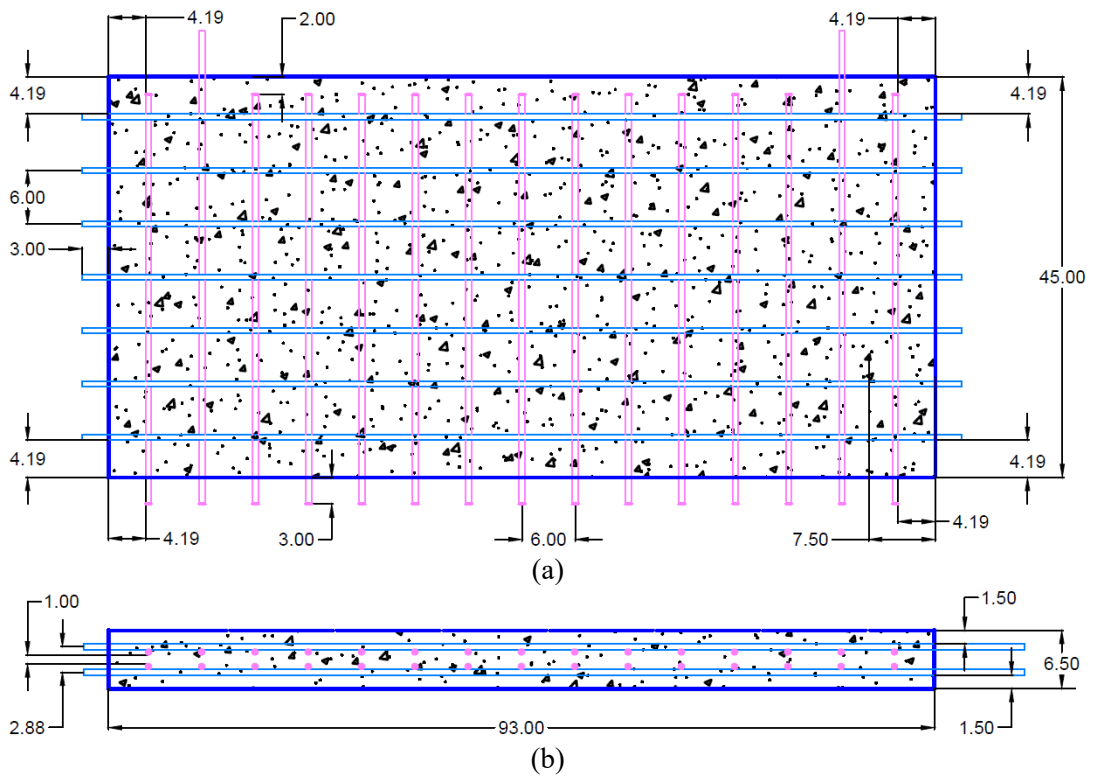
Dimensioned drawings of slabs 1-1 through 1-3: (a) top view and (b) side view
